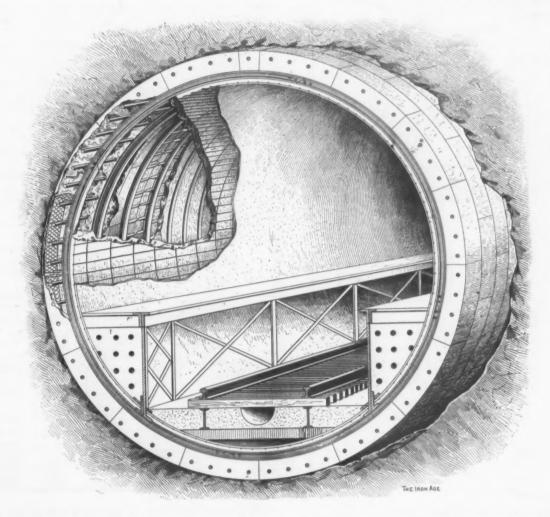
Section of the Hastings Reinforced Concrete Tunnel.—The Broken Parts Show Successively the Reinforcing in the Molded Blocks, the Circular Beams, Their Tying Connections, the First Coat of Concrete, the Woven Wire Reinforcing and the Finishing Coat of Cement.
